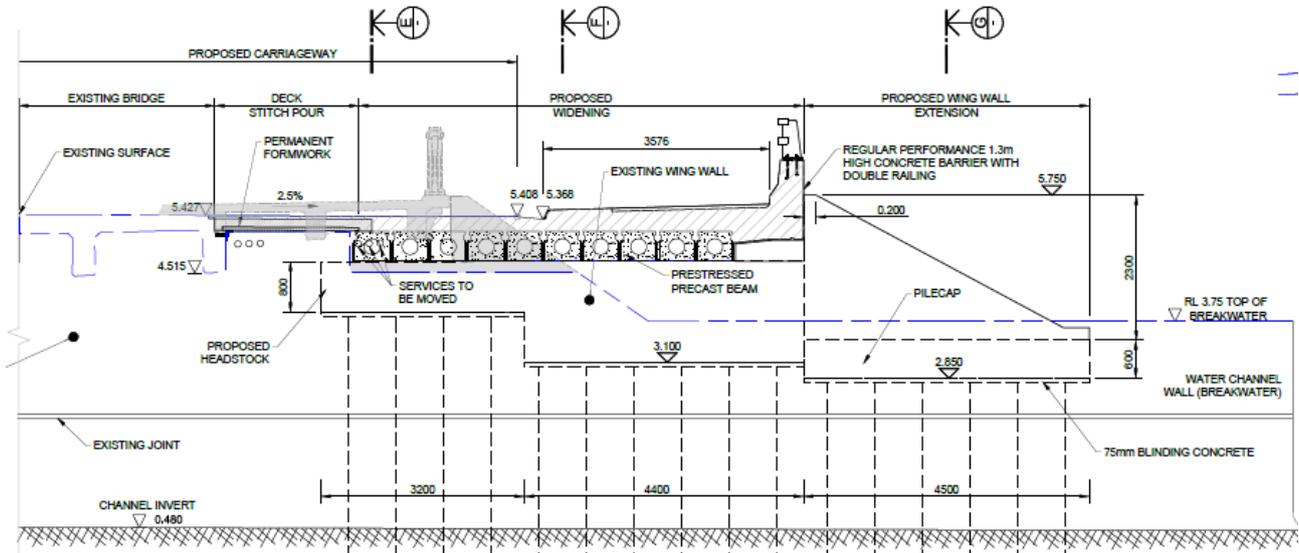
View of a typical cross section showing the proposed Iron Cove Creek bridge design on Parramatta Road at the intersection with Henley Marine Drive (VBA 2016)
